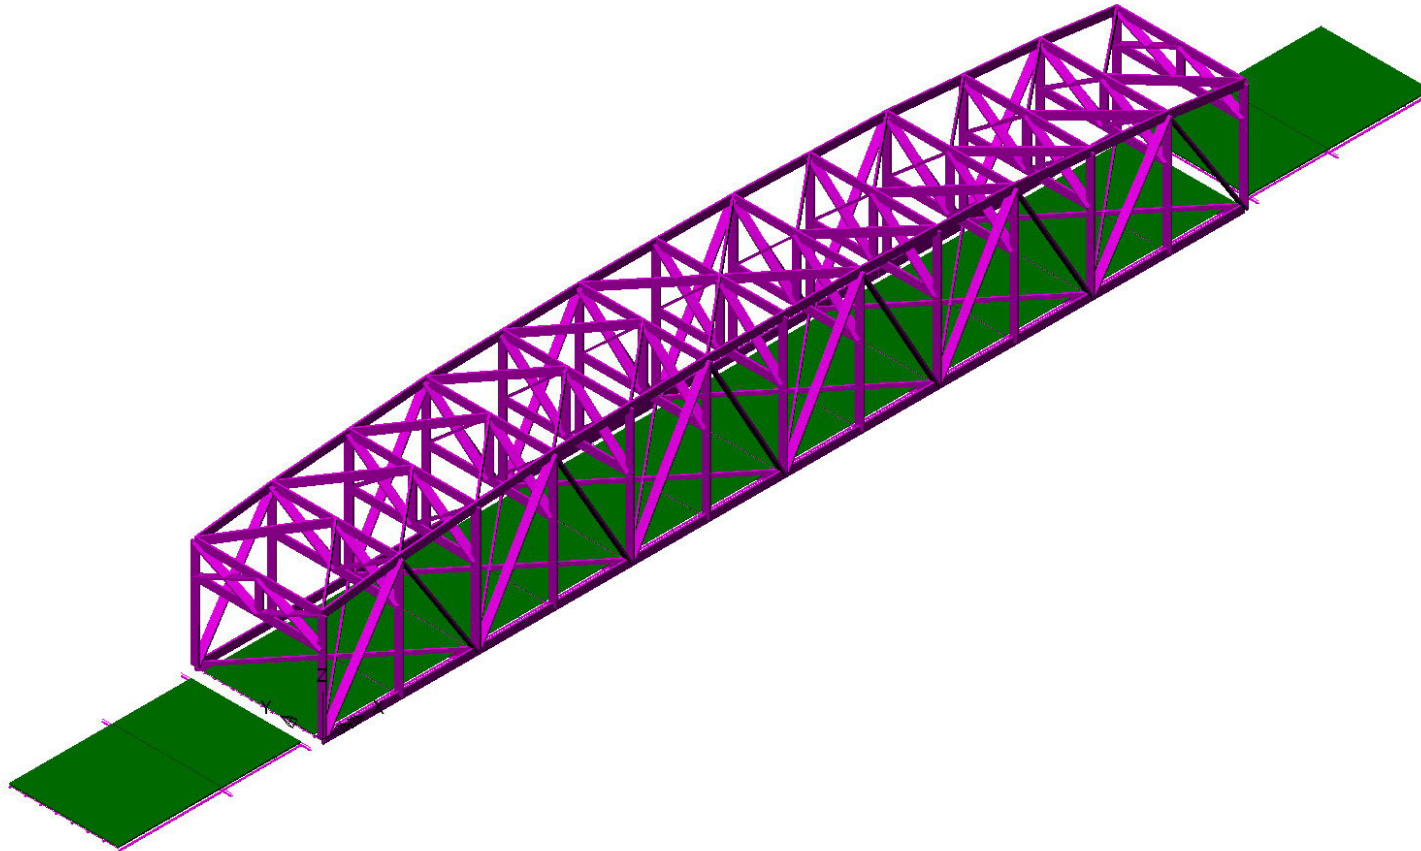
3D FEA Model Overview of Lift Span, Deck Structure for Tower and Approach Spans
